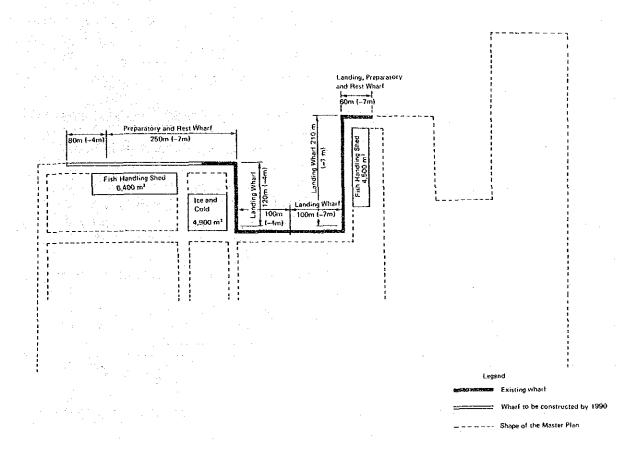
Fishery Port Facilities Layout in 1990
